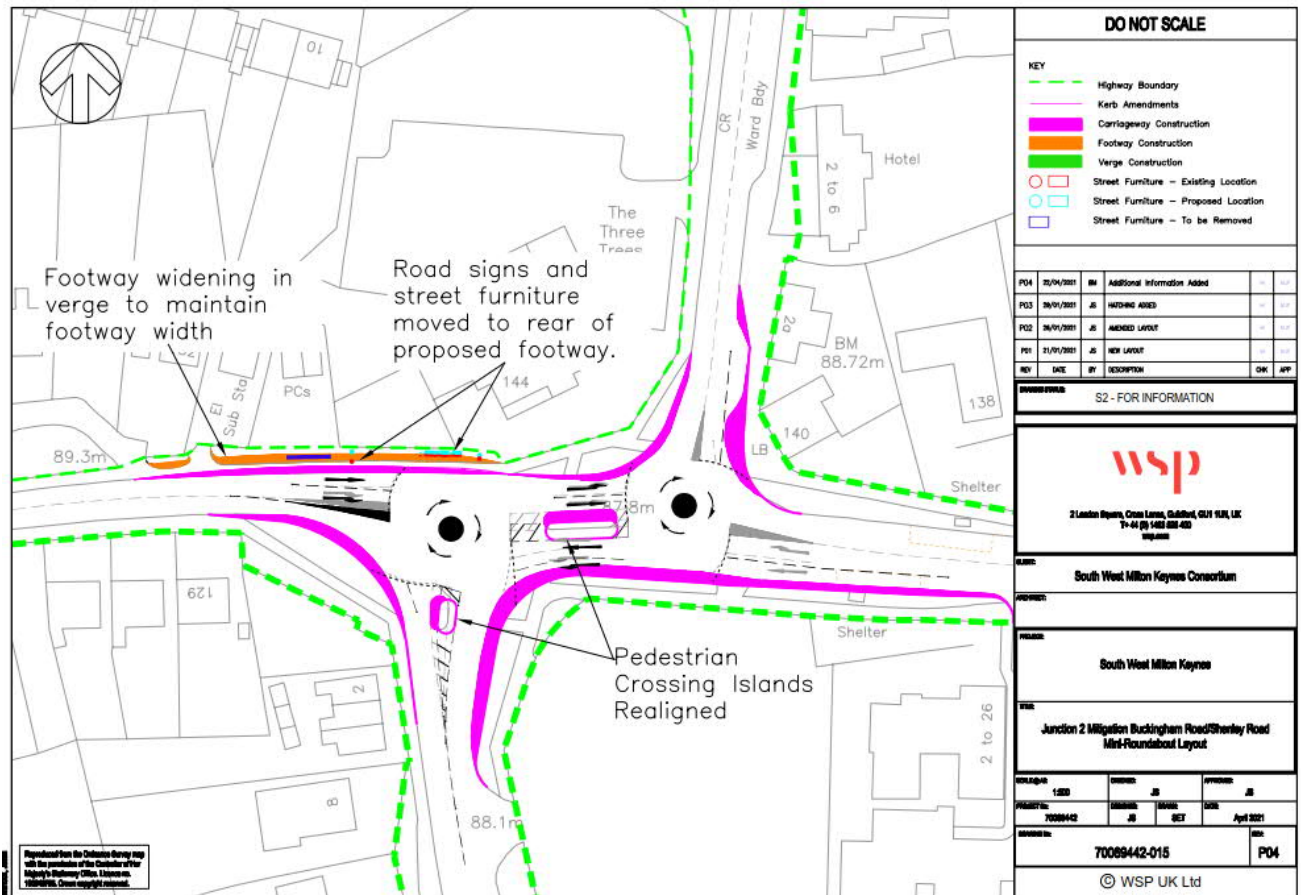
Junction 2: Buckingham Road/Shenley Road Mini-Roundabout Mitigation
